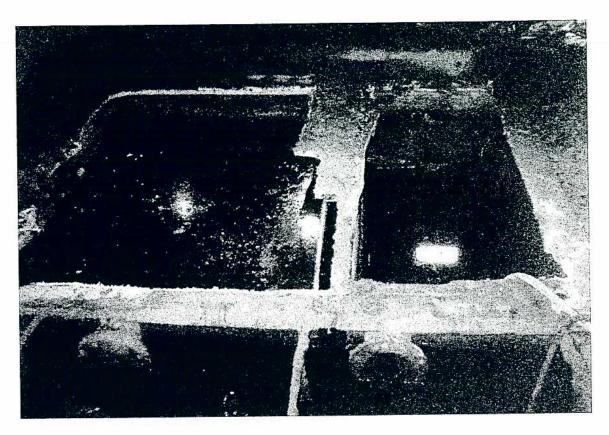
View of opened polyethylene tank from Building 4 Pit.
